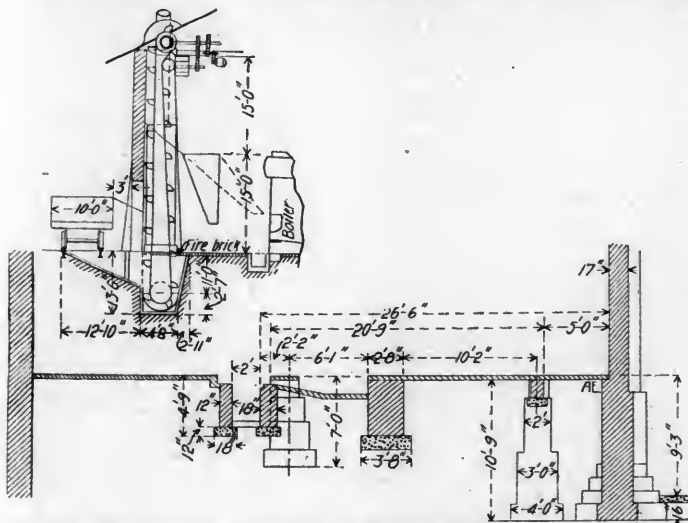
Sections in Boiler Room Showing Boiler Foundations and Coal Elevator.
